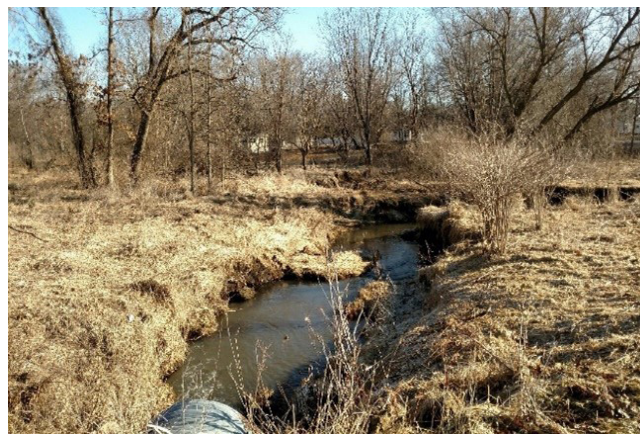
Picture of culvert outlet underneath Woodhaven Drive East looking towards section 8 & 9 as it looked in 2019
